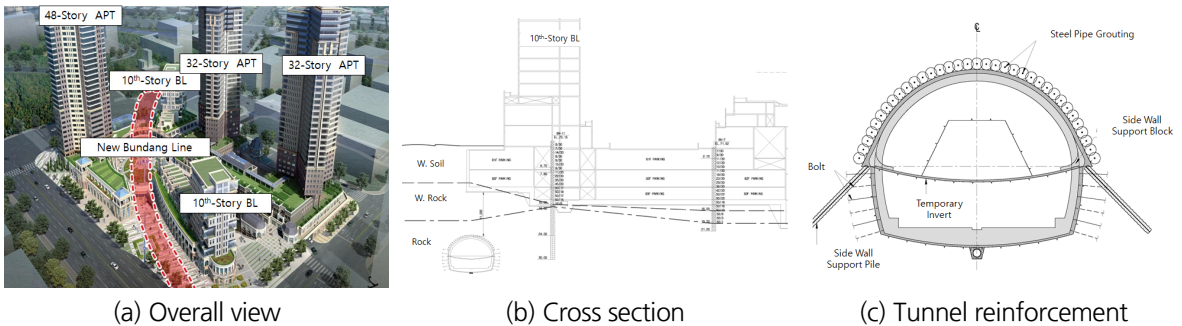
Urban tunnelling under building structure in New Bundang railway (Shin et al., 2009)
